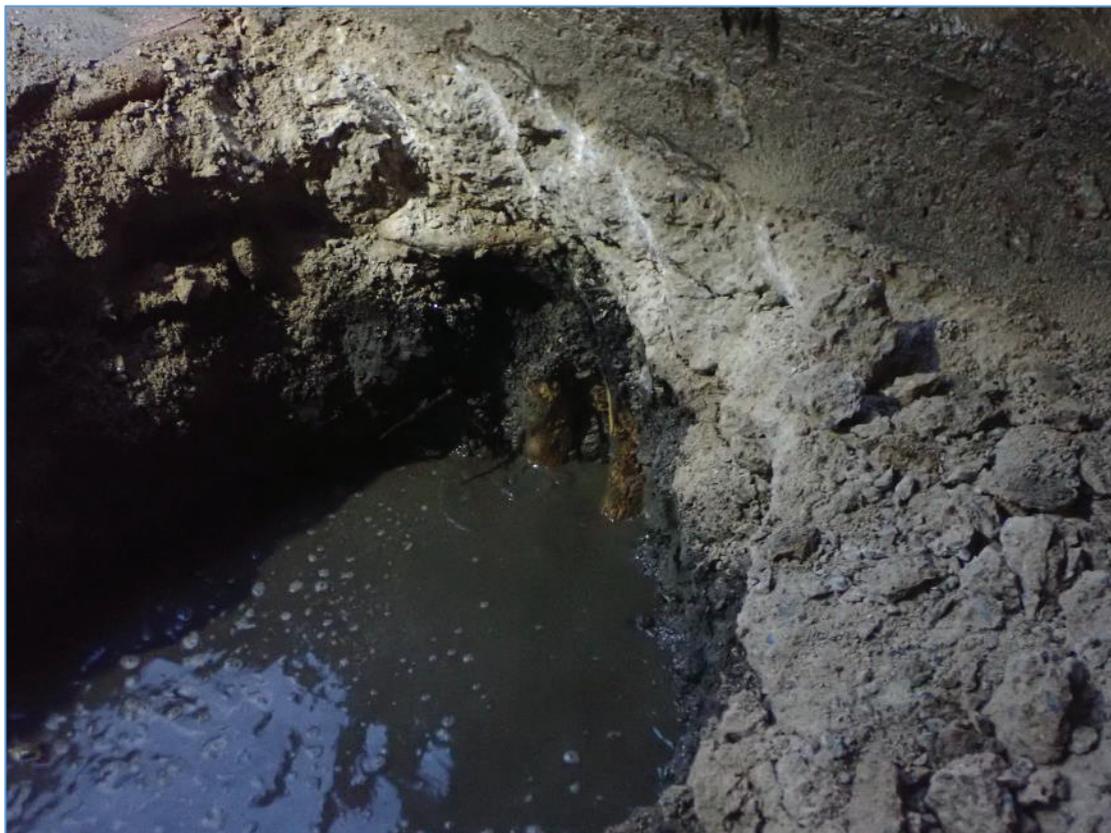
TP-03 at Pier 2. Removal of the covering concrete reveals river clay and starling piles.
